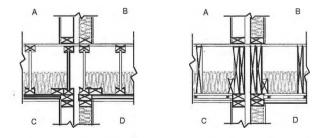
Sketches showing the floor-wall junctions details for comparison of solid lumber joists and wood-I joists.
